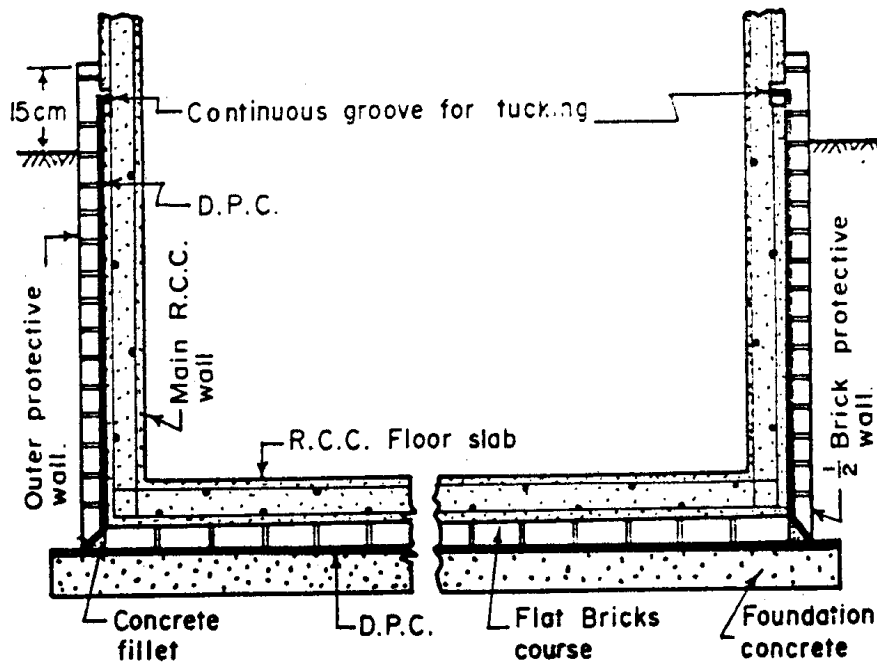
FIG D.P.C. TREATMENT FOR BASEMENT IN DAMP SOIL
